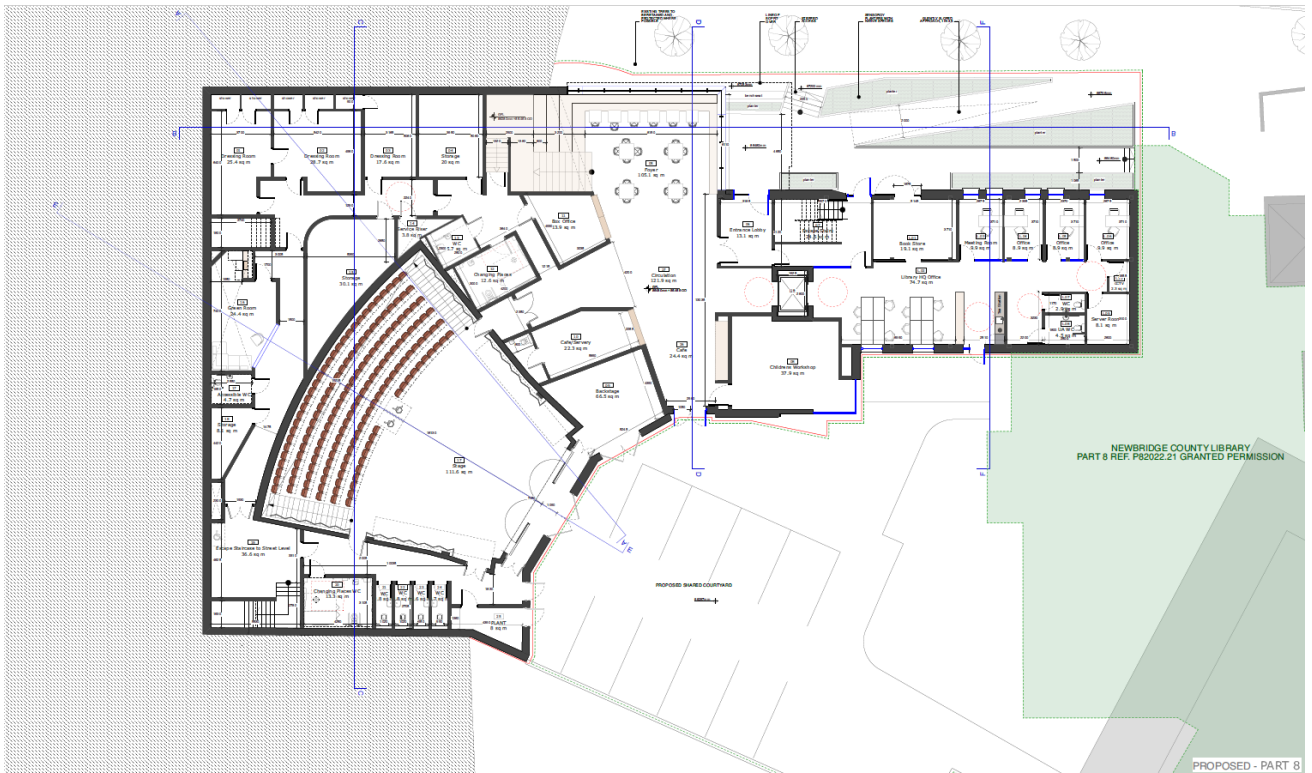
Proposed Ground Floor plan (Source: Studio Red Architects)
